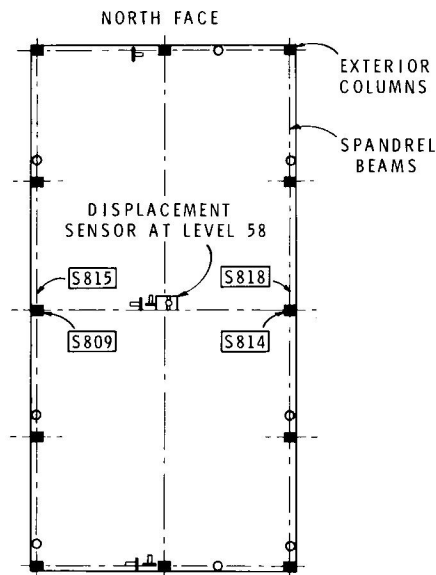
Plan view of instrumentation layout, Commerce Court, Toronto
